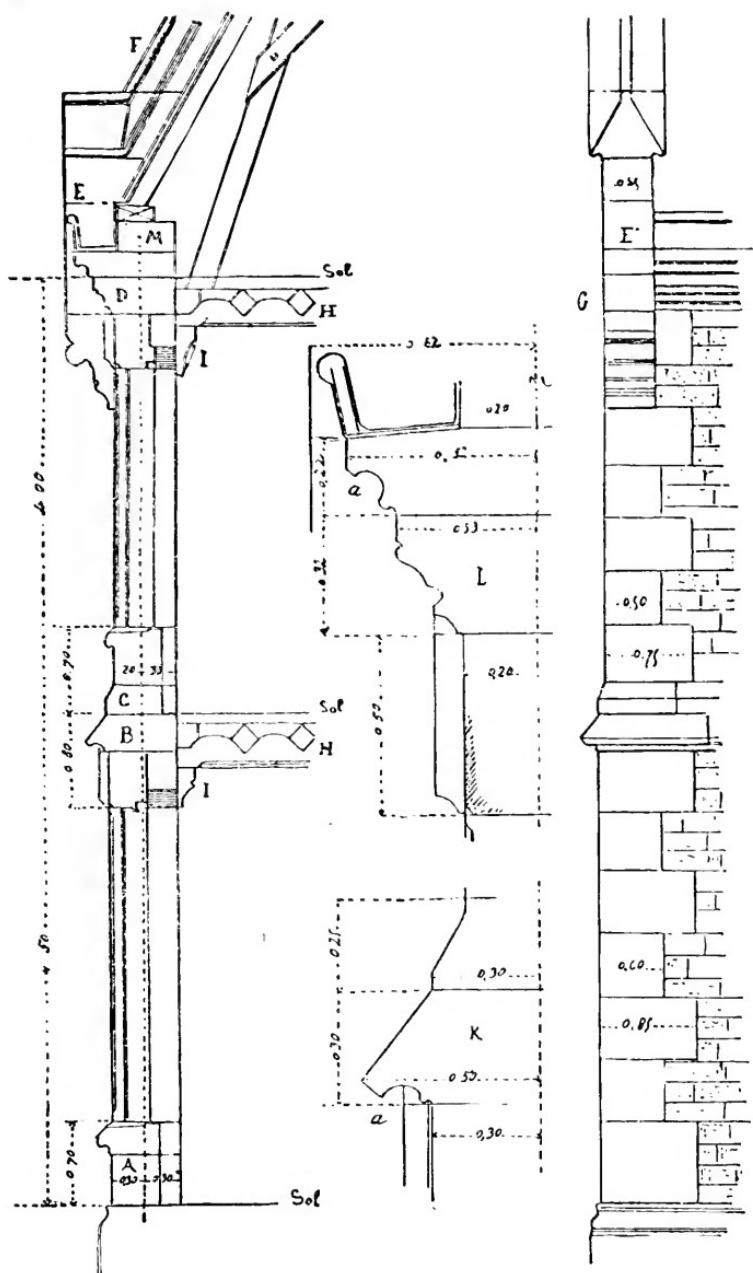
SECTION AND DETAILS OF FRONT WALL. — Page 184.
